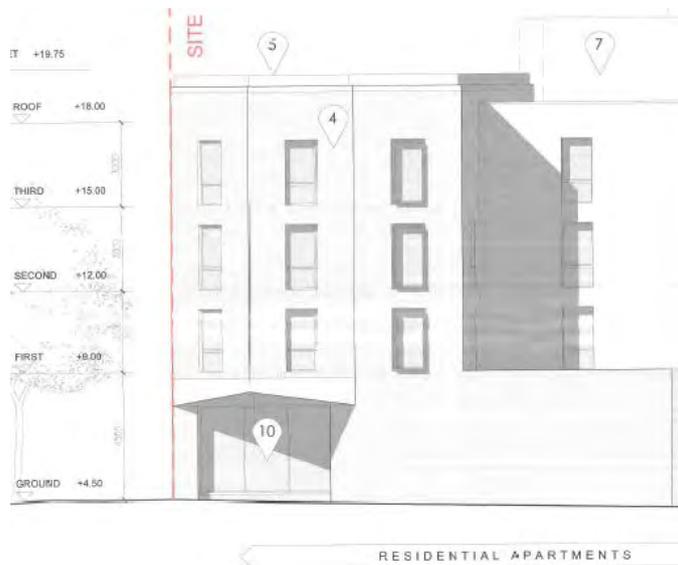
Proposed corner feature at Southwell Road/Queen's Parade
